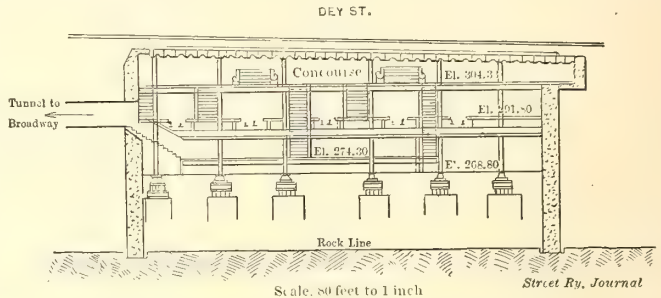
CROSS SECTION OF CORTLANDT STREET STATION
